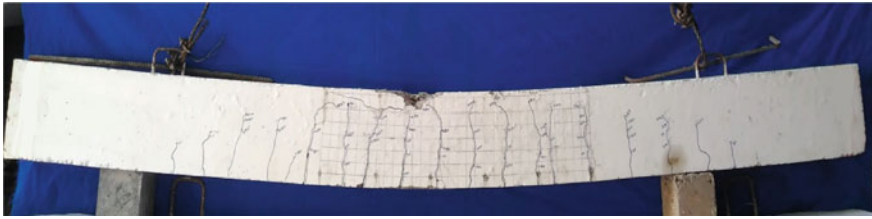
Crack pattern of conventional cement concrete beam
